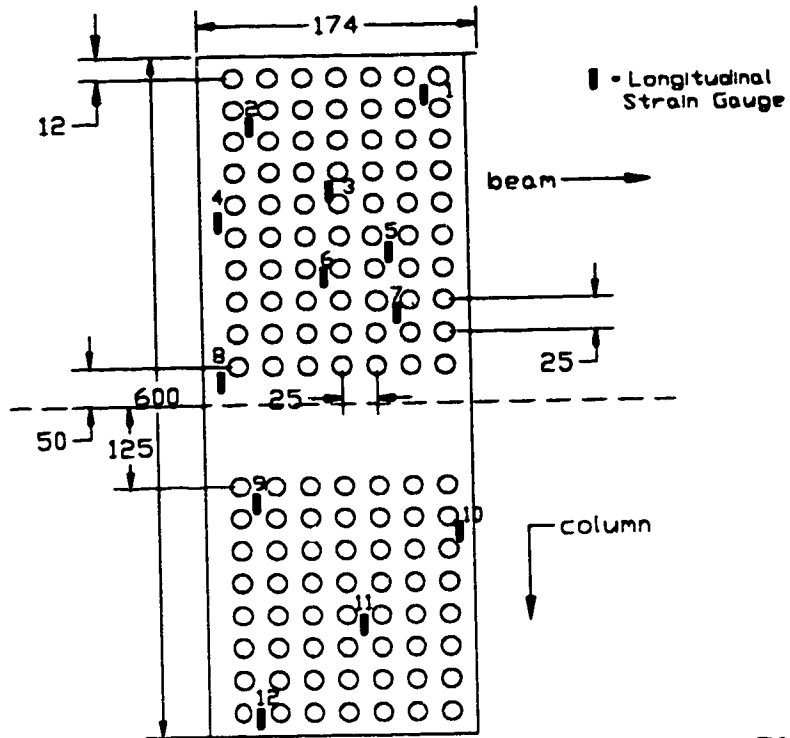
Strain Gauge Layout on Side Plate for Specimen C1, C2, C3
